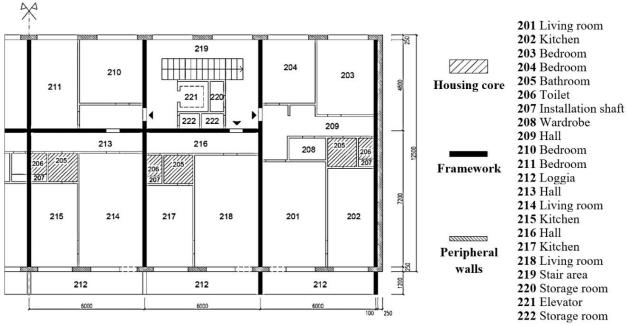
Typical floor of the panel house type T 08B KE [2]
